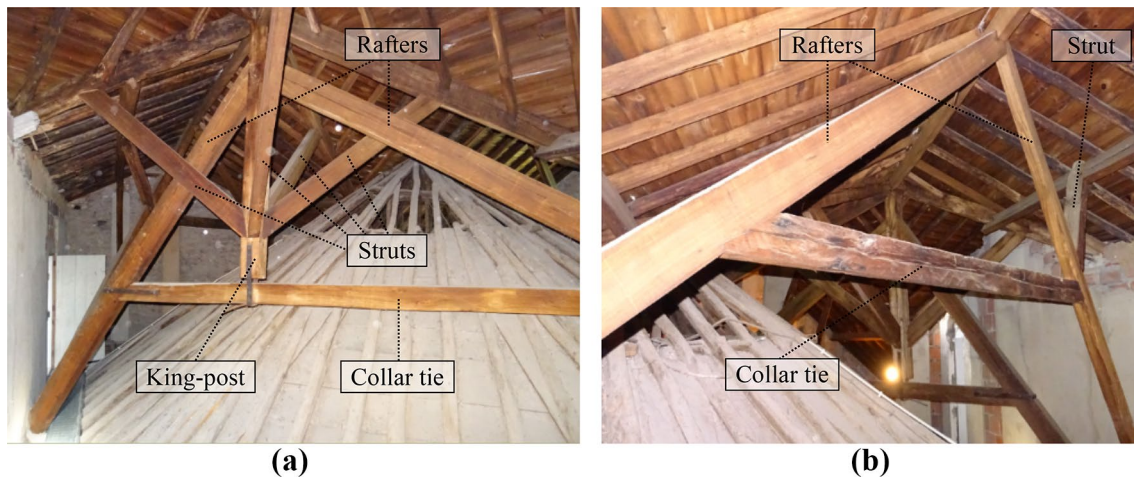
Components of the king-post truss (a) and the A-shaped truss (b)
